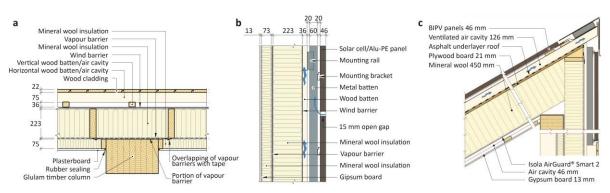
Wall with wood cladding (a), BIPV/Alu-PE panel (b), and BIPV-covered roof (c).
